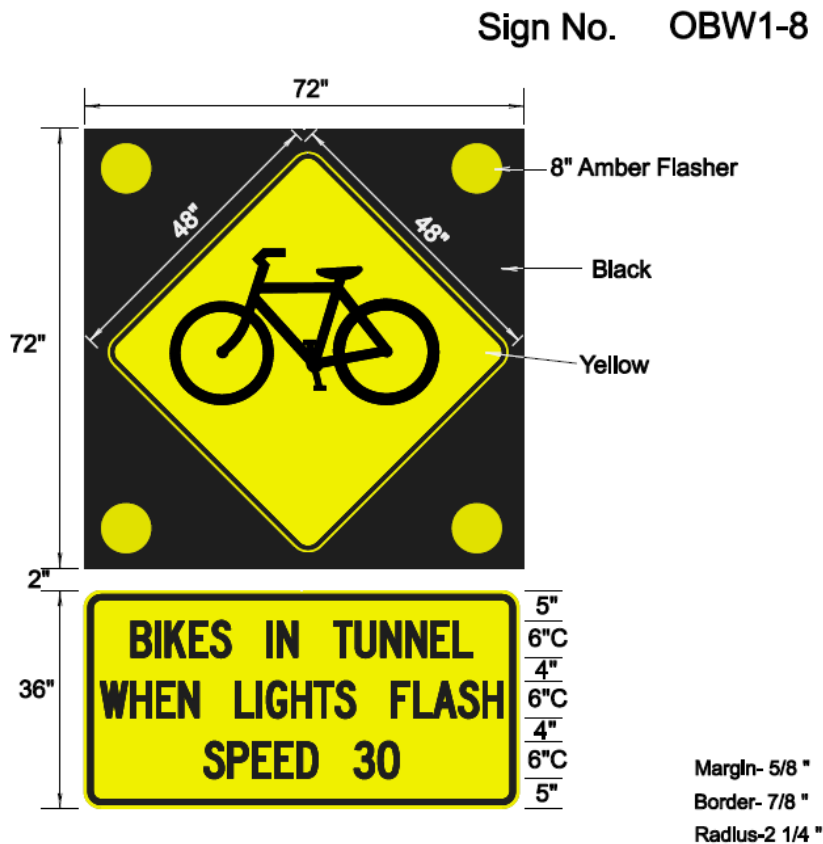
| Actuated Warning Beacon – Tunnel, Example 1
